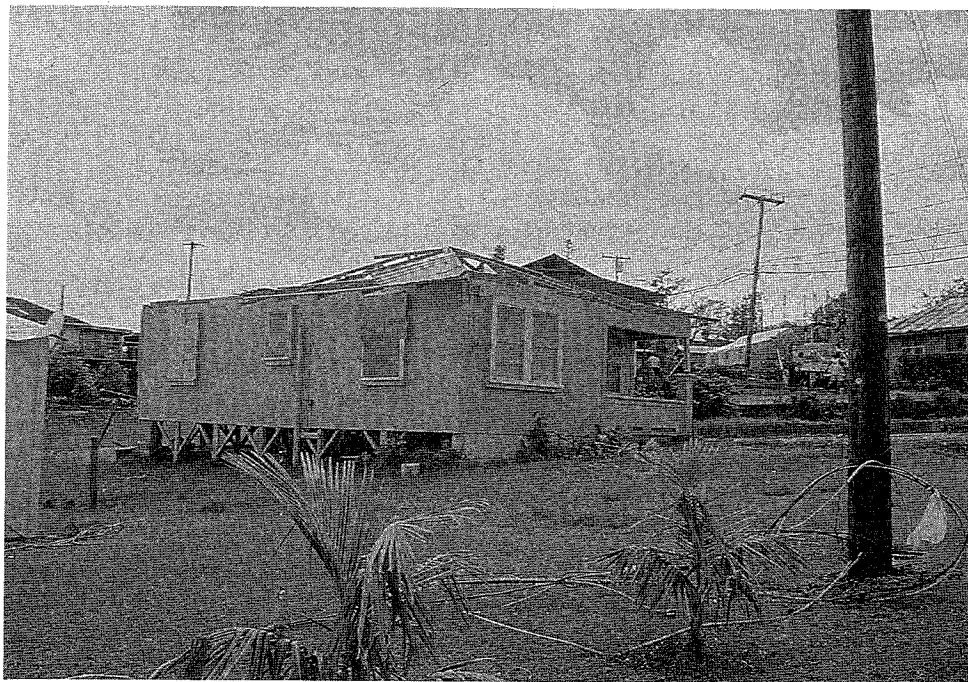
Wind-damaged home with a Level 3 damage rating for overall building condition. This single-wall home suffered severe damage to the roof—both structurally (roof framing) and in envelope soundness (loss of metal sheathing/roofing). Though interior water damage was severe, the exterior walls and foundation remained intact.
